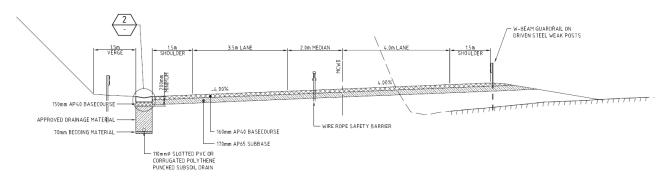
Typical Cross Section Detail of Scour Site Realignment Works
